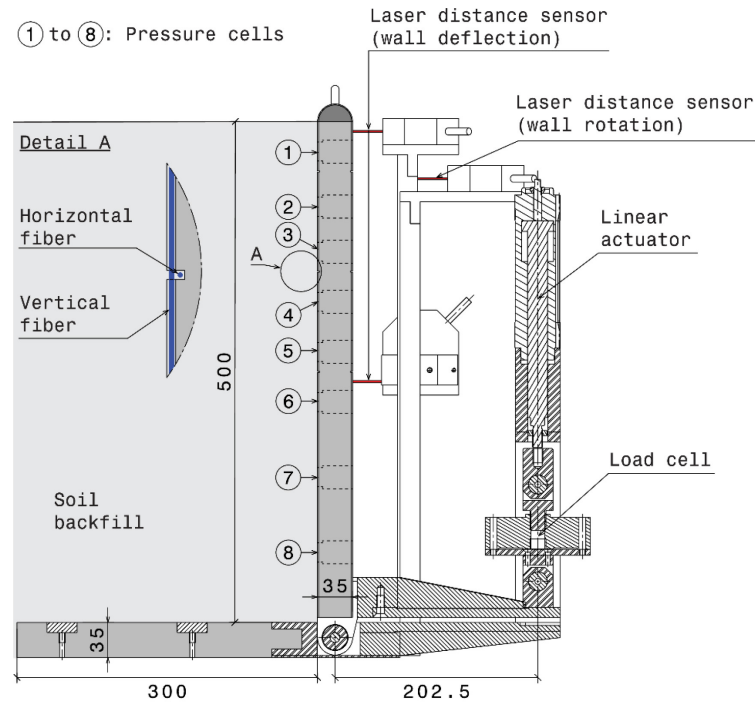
Section of the test wall. Dimensions are given in millimetres.
